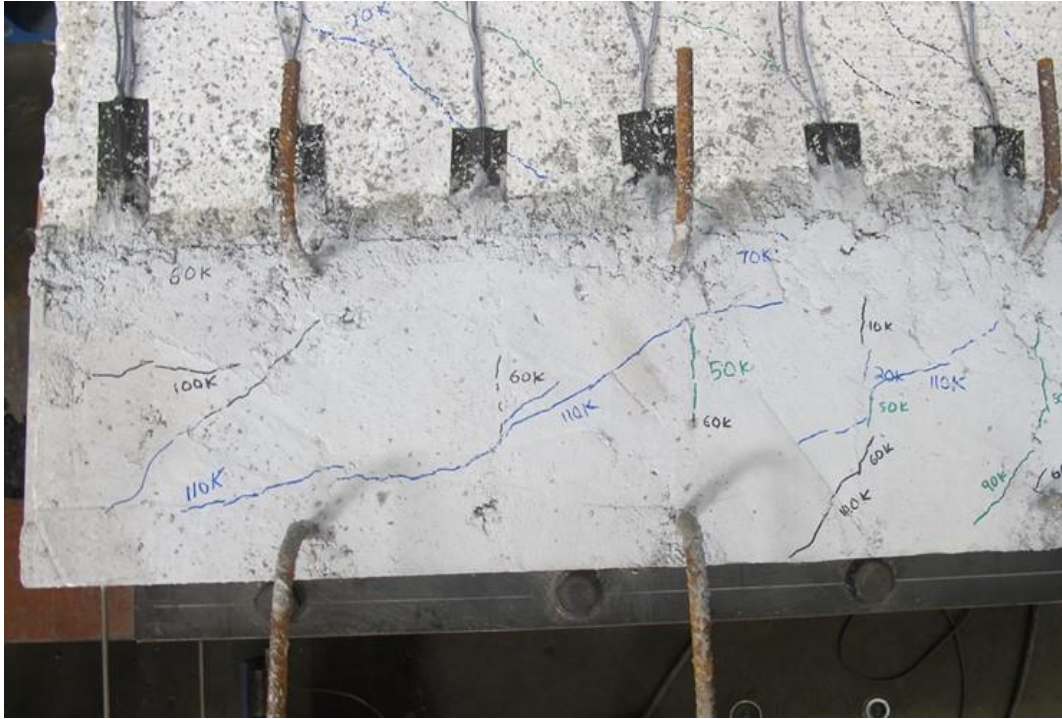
Even Distribution of Cracking in Closure Pour of 6" Reinforcement Spacing Detail at 110 kips
